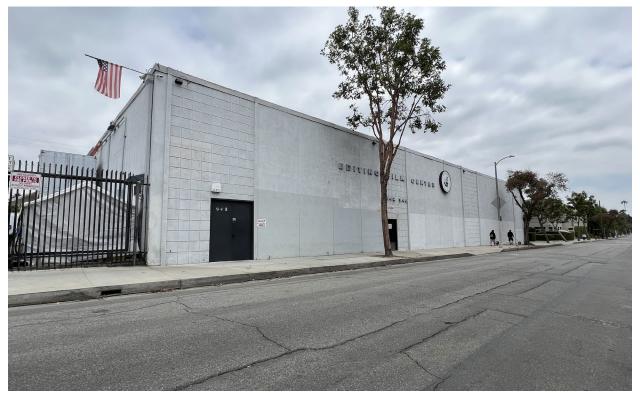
West elevation, view looking southeast (GPA, June 2023).
